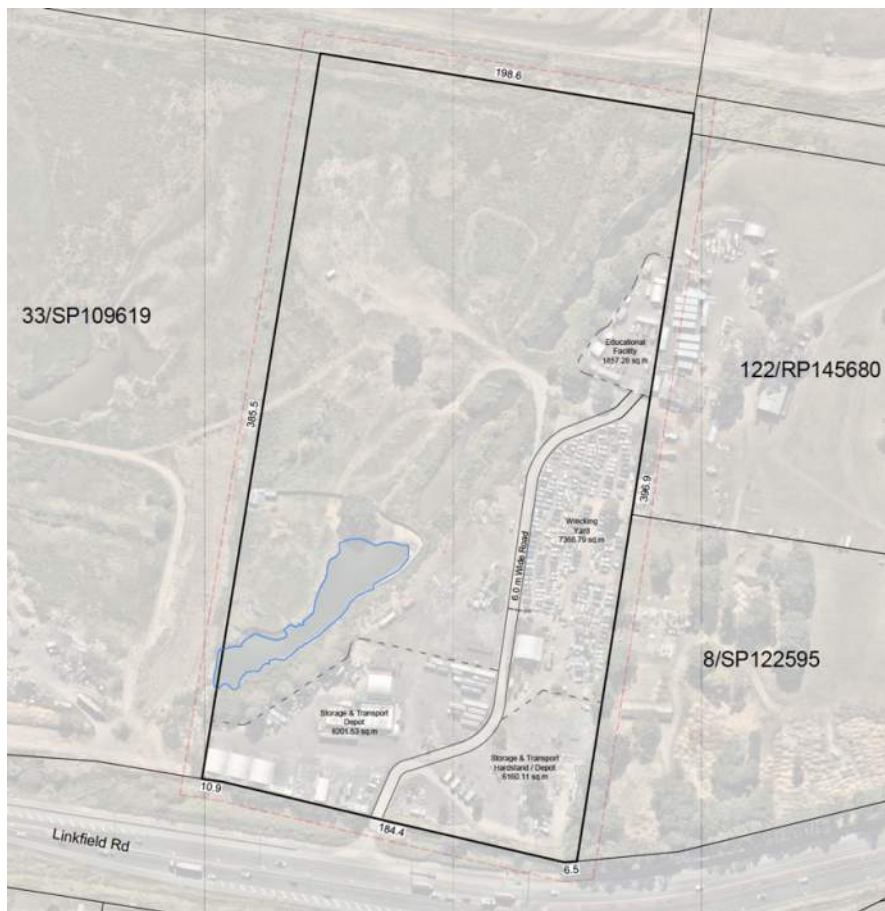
Extract of the Proposed Site Plan (source: ARC Planning)
